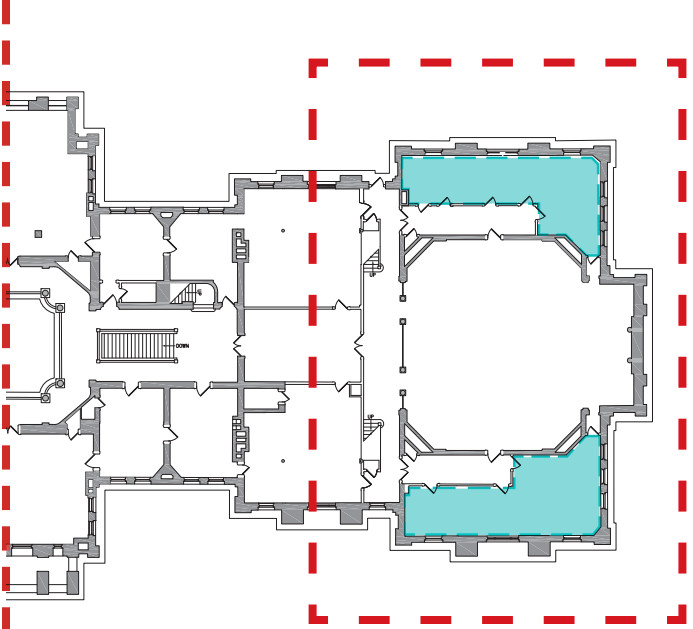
Second Floor Level Selective Removals Plan.
